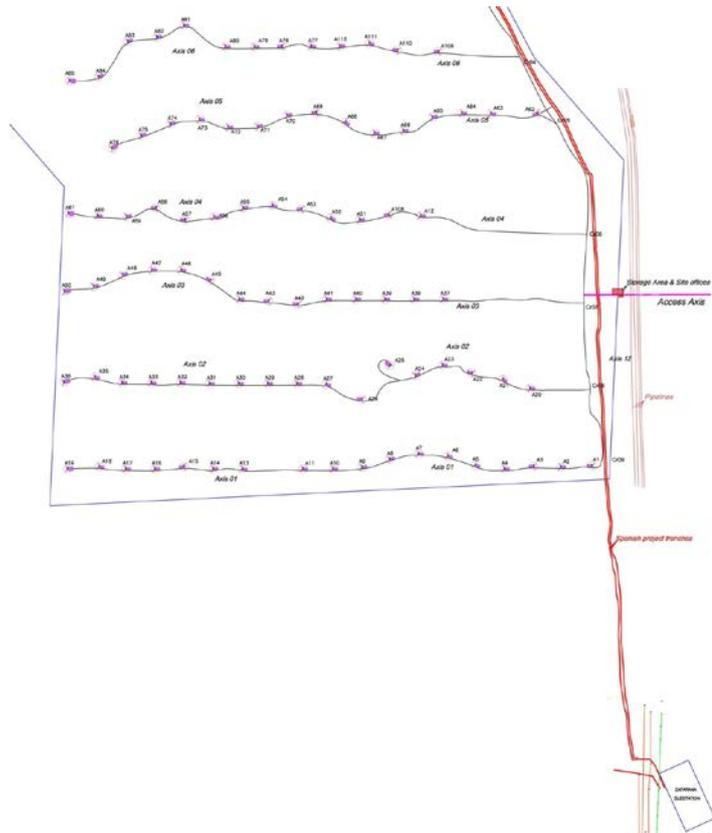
Typical arrangement of wind farm siting kiosks and cabling to 220 kV substation
